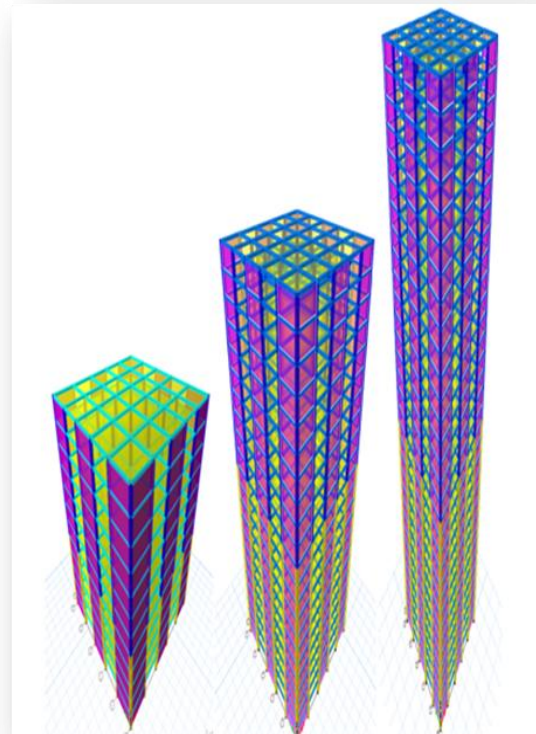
ISOMETRIC VIEWS OF R.C .FRAMED BUILDING (G+10, G+20, G+ 30)
